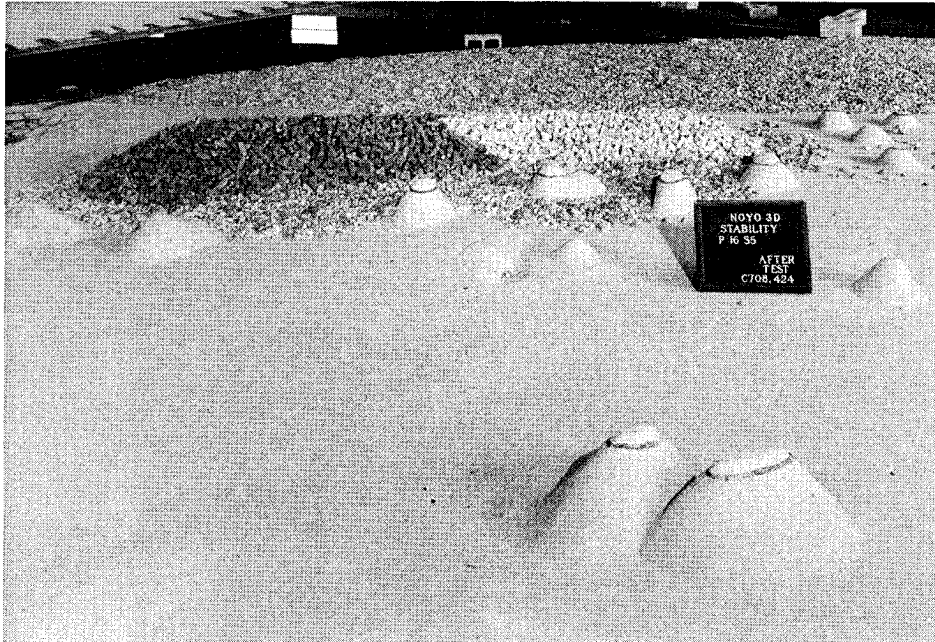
Sea-side view of Plan 16 after five series of modified Storm IB waves
